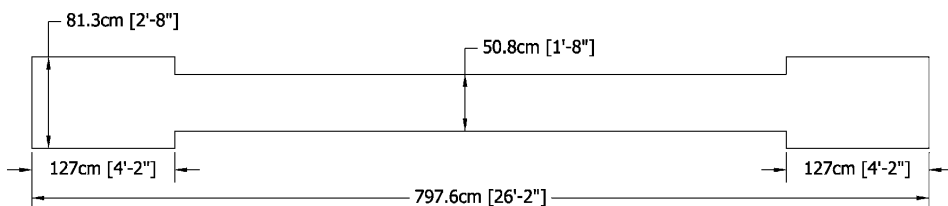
Plan view of the shear wall (redrawn from Nawy 2000)
